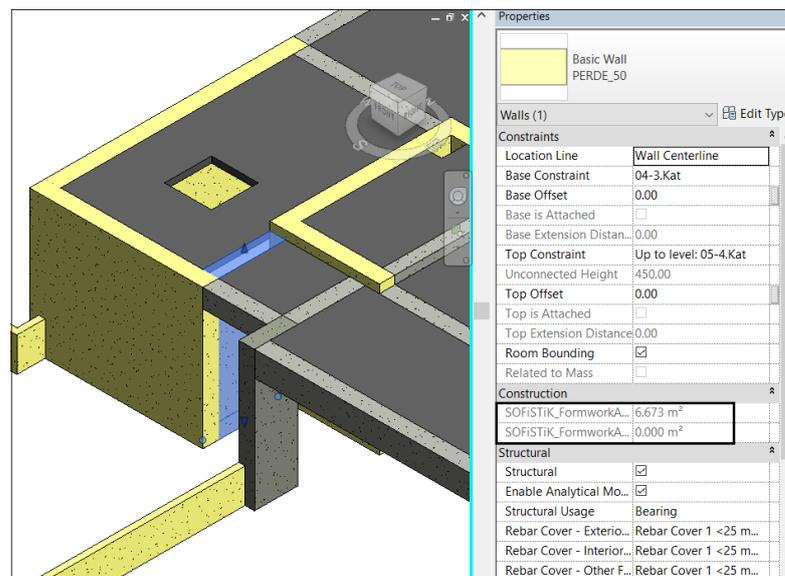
Miscalculated Formwork Area of Structural Wall in Revit Model
